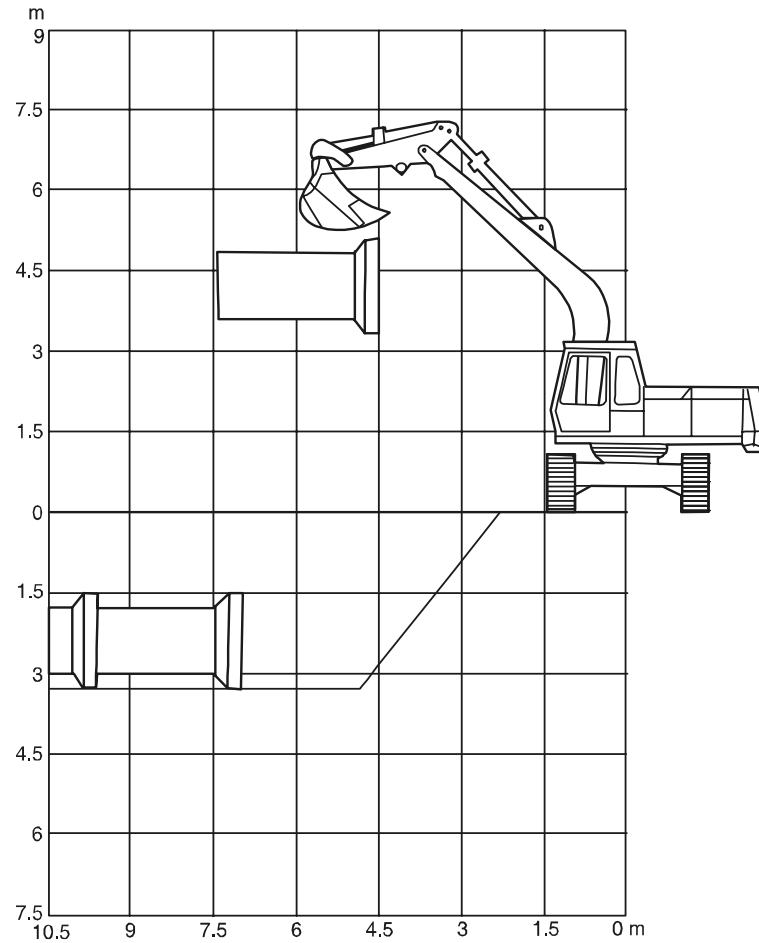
Pipe laying by hydraulic excavator (courtesy : Liebherr).
